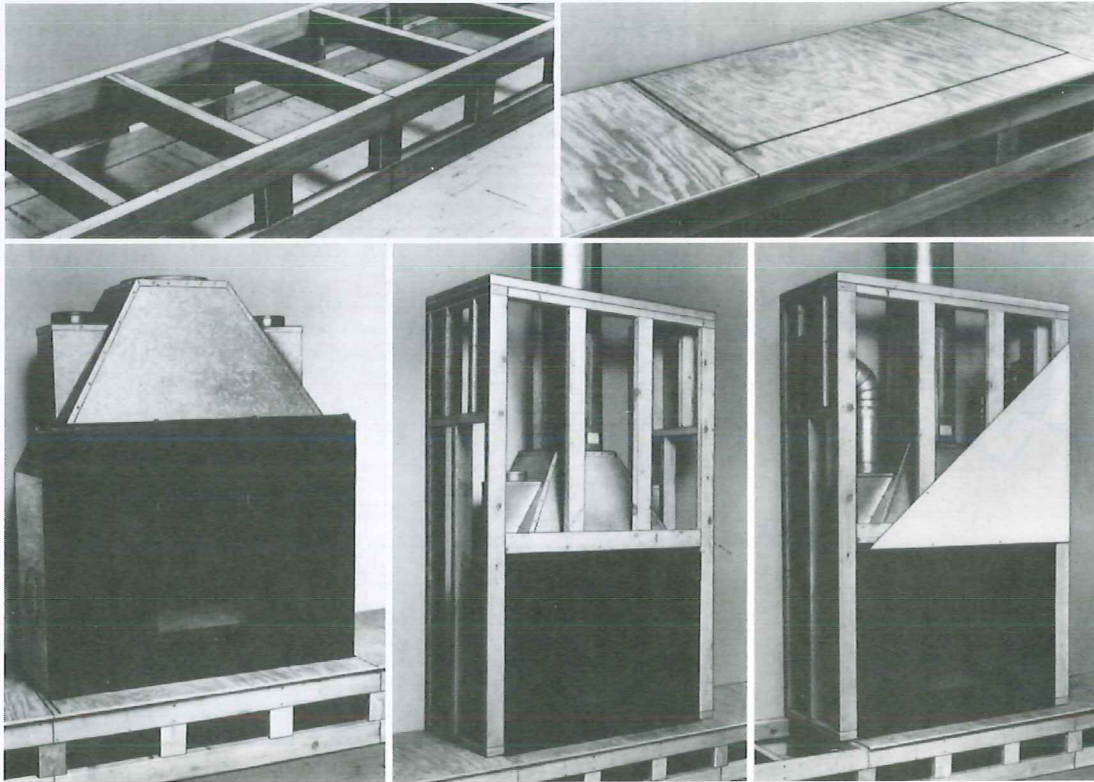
Installation of a prefabricated steel, heat-circulating fireplace in frame construction. (Heatilator, Inc.)
